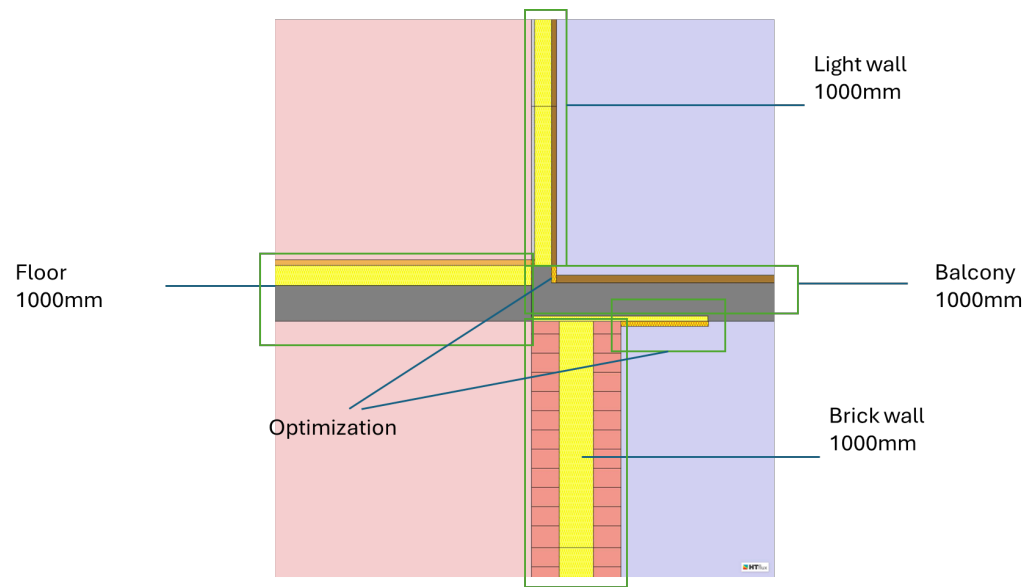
LCA-thermal bridge calculation method-Multi storey building
